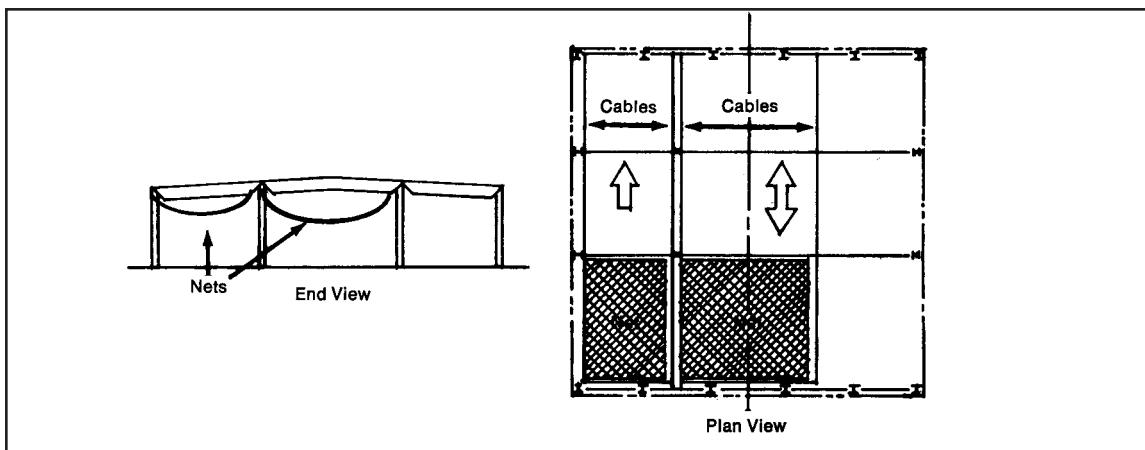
A plan view of an example of rigging safety nets for roofing operations.
